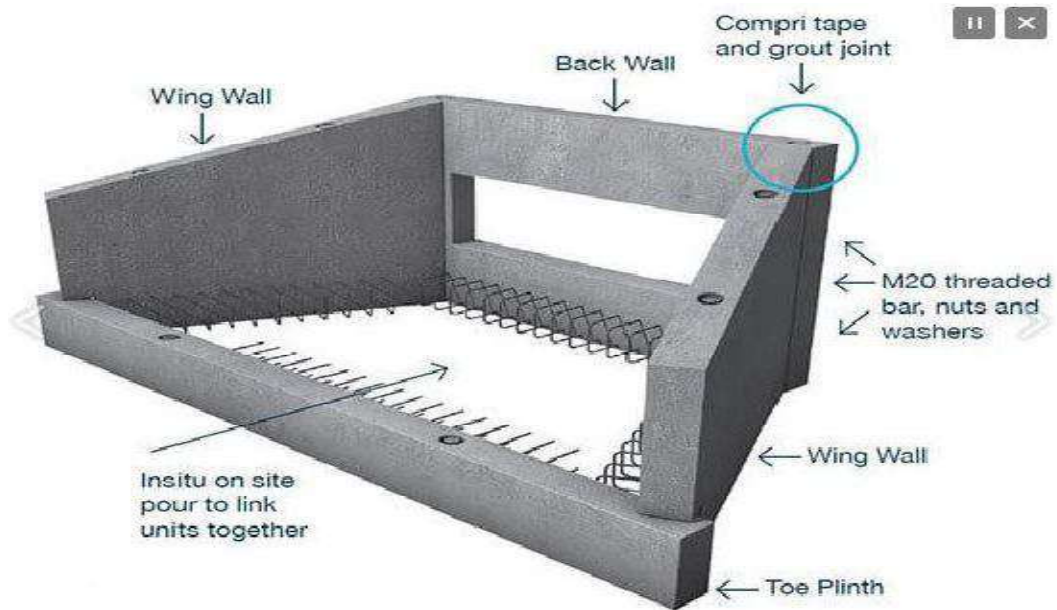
Front of Box Culvert (Source: metal-culvert.com).
